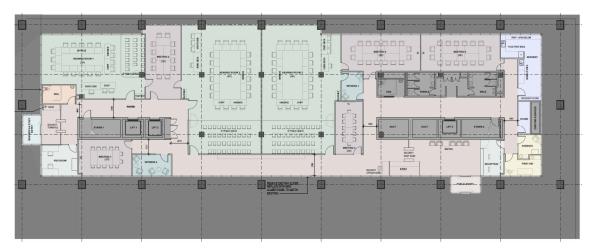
Ground floor plan indicating the proposed internal planning arrangement; the three hearing rooms are identified in green, breakout/meeting rooms in grey, witness rooms in blue
